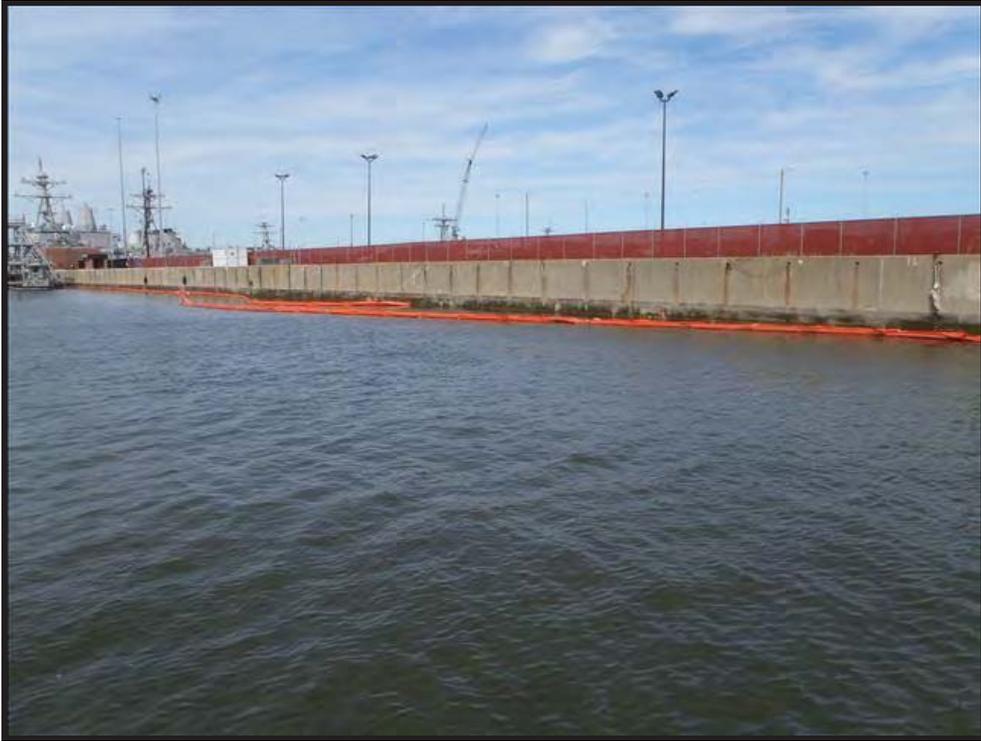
Overview of CEP175 Bulkhead from the water, Sta. 0+75, looking west.
